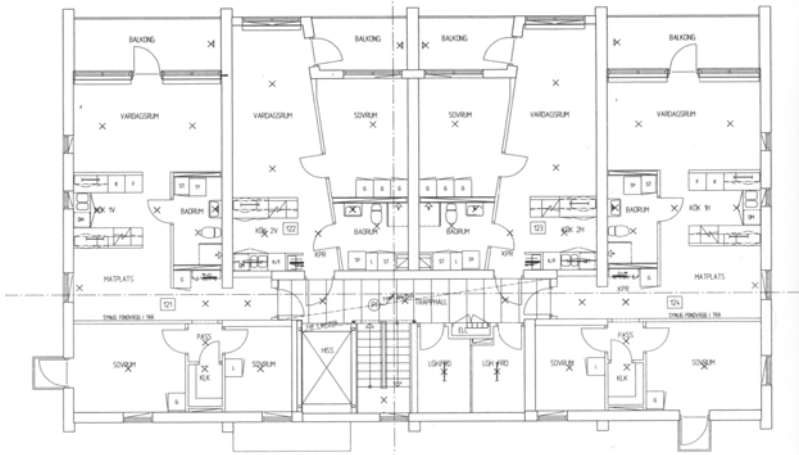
Layout for Sundsvall I, apartment block 1-3, floor 1-4 in case #3.
